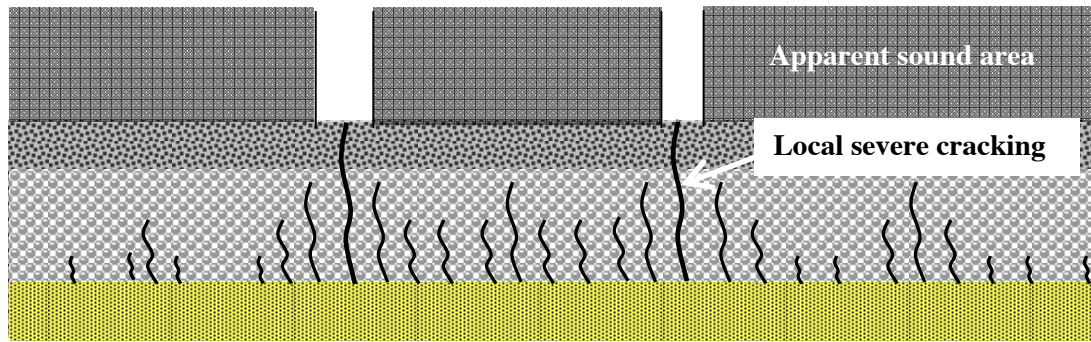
Schematic damage appearance in a pavement
